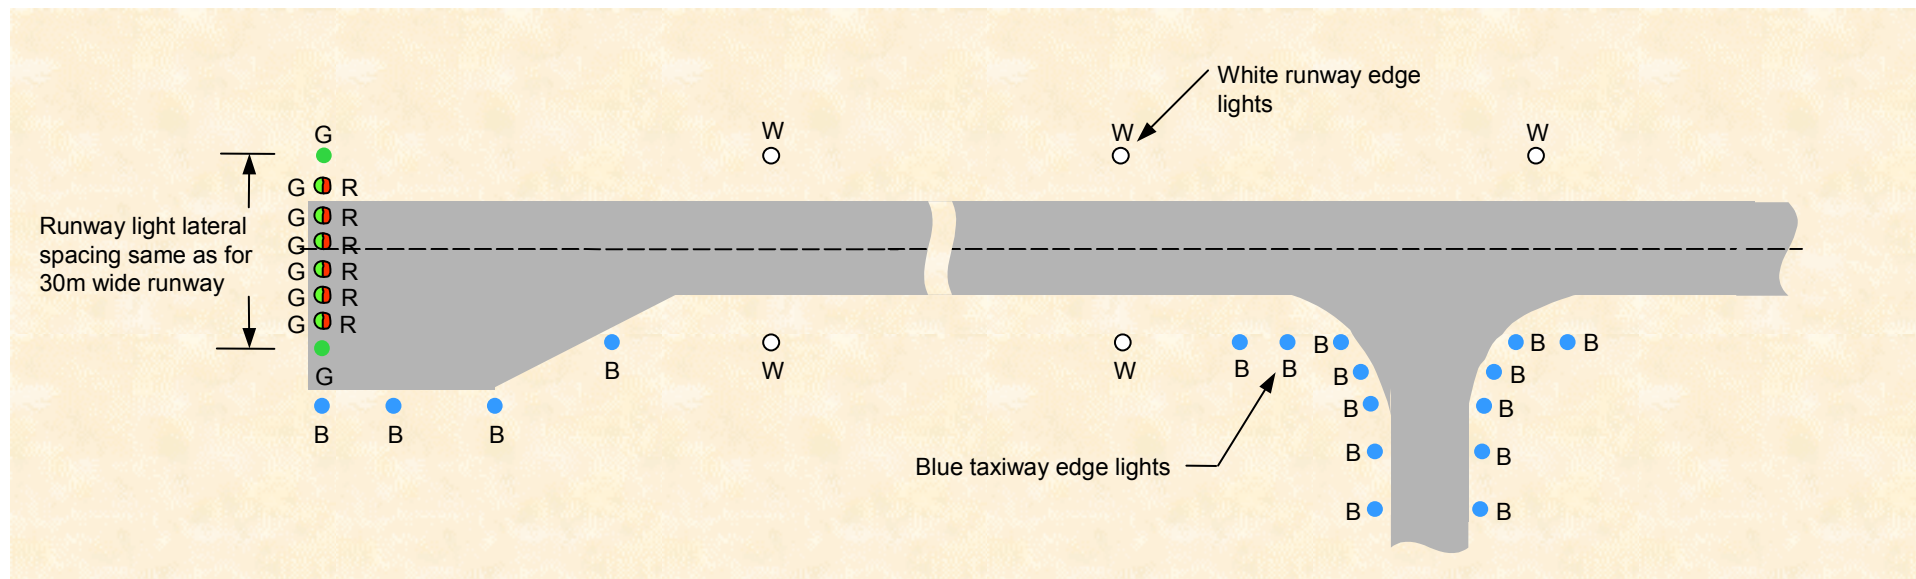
Typical Light Layout Where Runway Pavement is 23 m or 18 m wide
